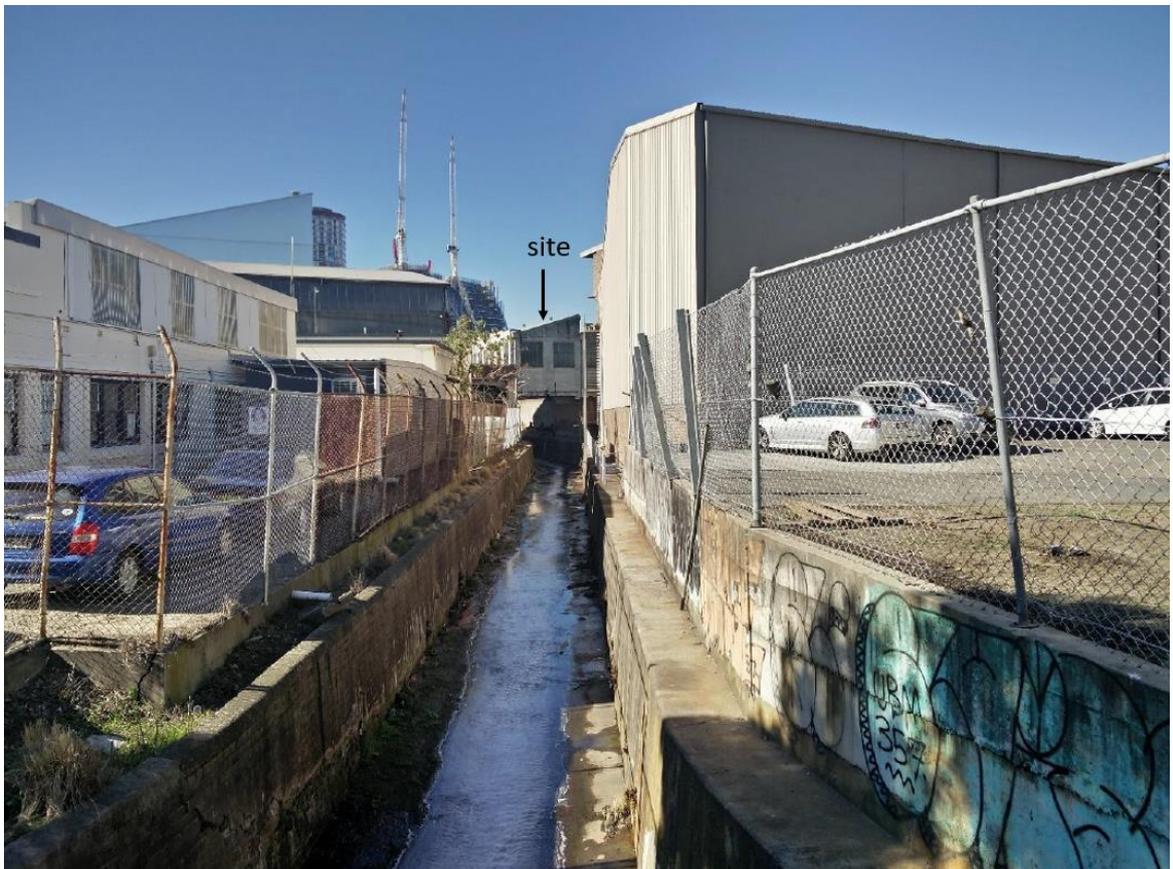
Looking west along the Sheas Creek open stormwater channel (Source: Applicant's SEE)
